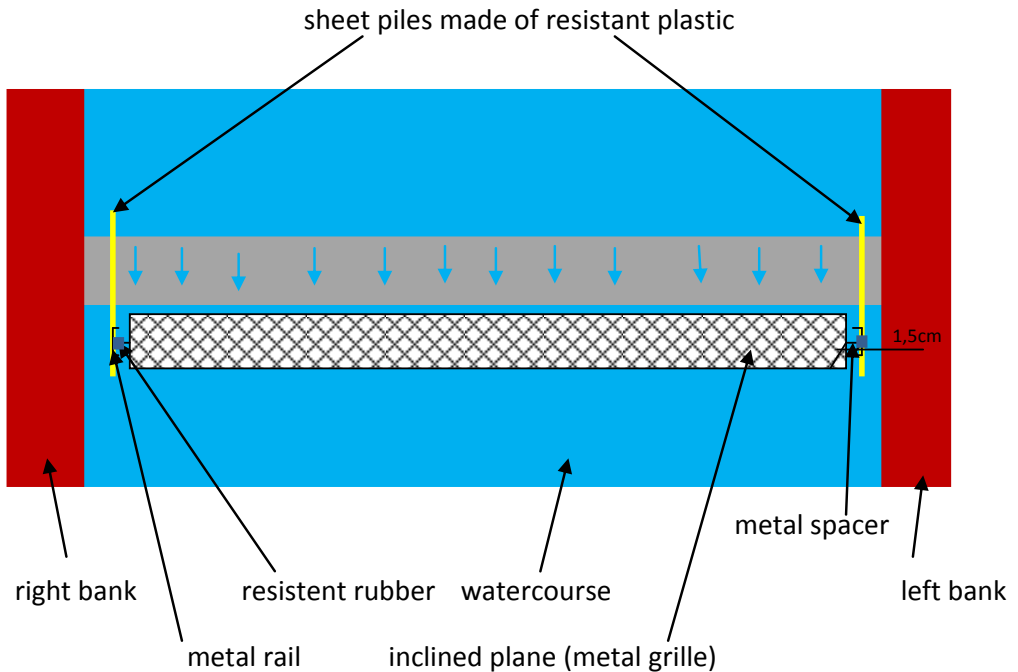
Positioning the gridded platform towards the sheet piles made of resistant plastic- indicative scheme
